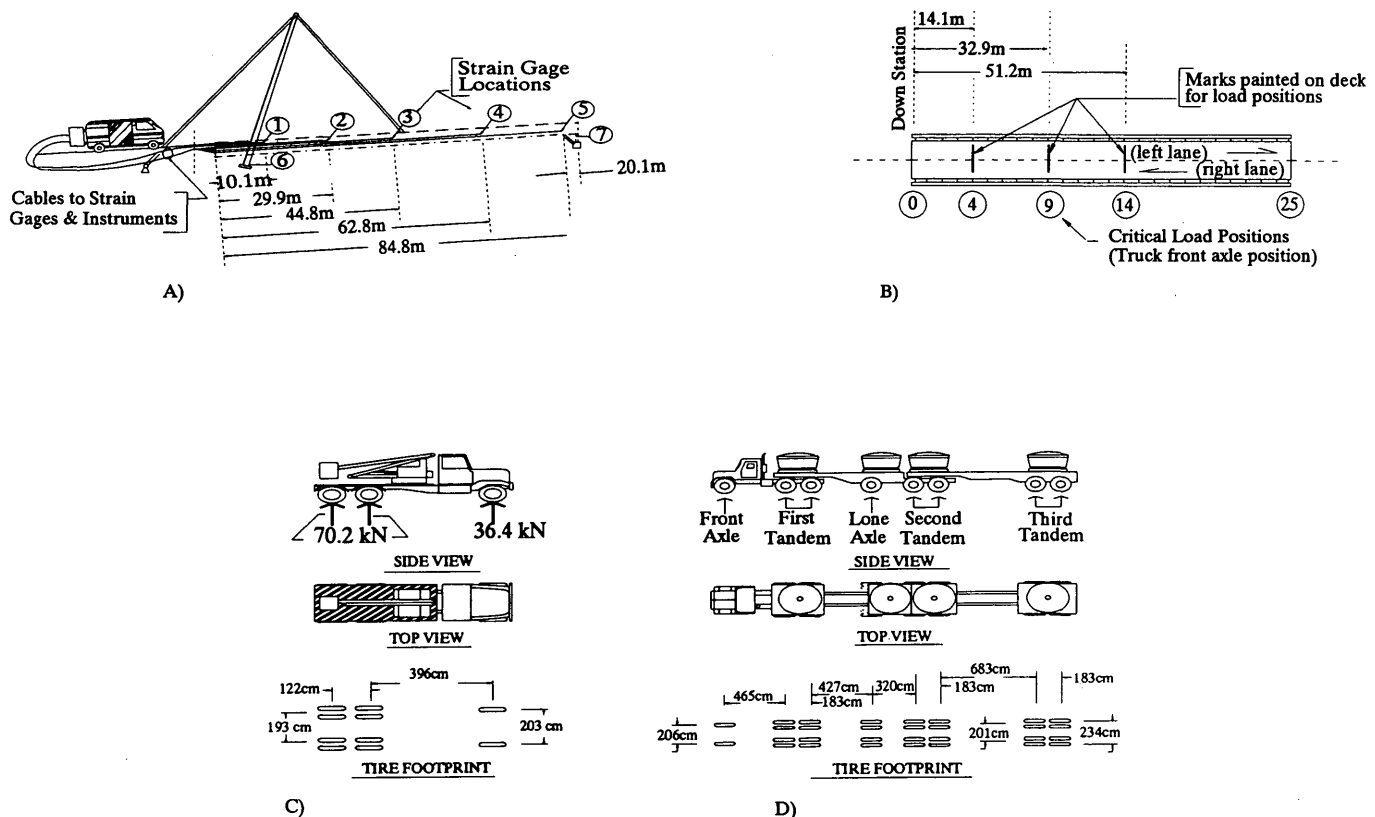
Arrangements for testing: a, instrument monitoring equipment; b, bridge frame and load position; c, snooper truck; d, B-train (ore truck).
